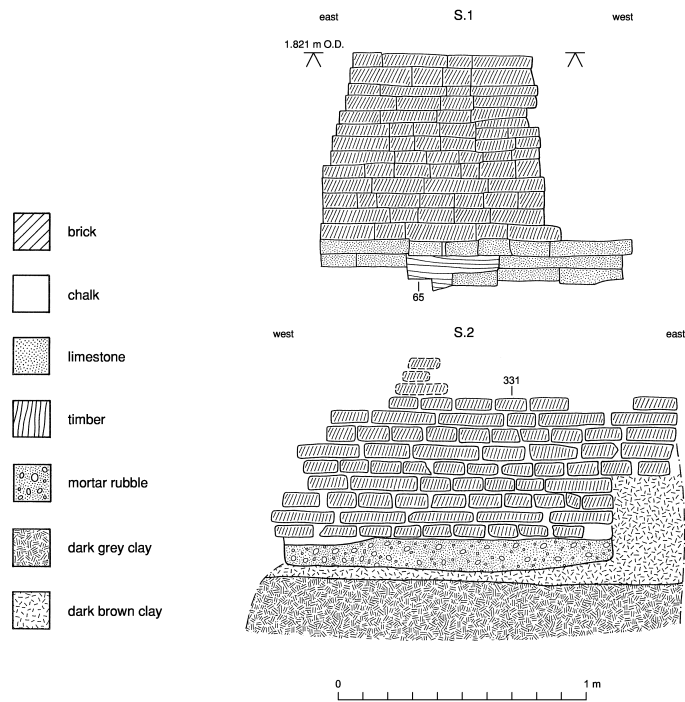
Wall elevations at the Beverley Gate. Elevation S1 shows the battered external north face of the projecting northern buttress at the front of the late medieval Gate; at its base, the end of one the Phase Ia timber sole-plates can be seen to be encased within the later medieval brickwork. Elevation S2 shows the southern external face of the Phase III northern guard-chamber; this has been cut into the top of the Phase Ia clay rampart – part of which survives on the eastern side of this section.
